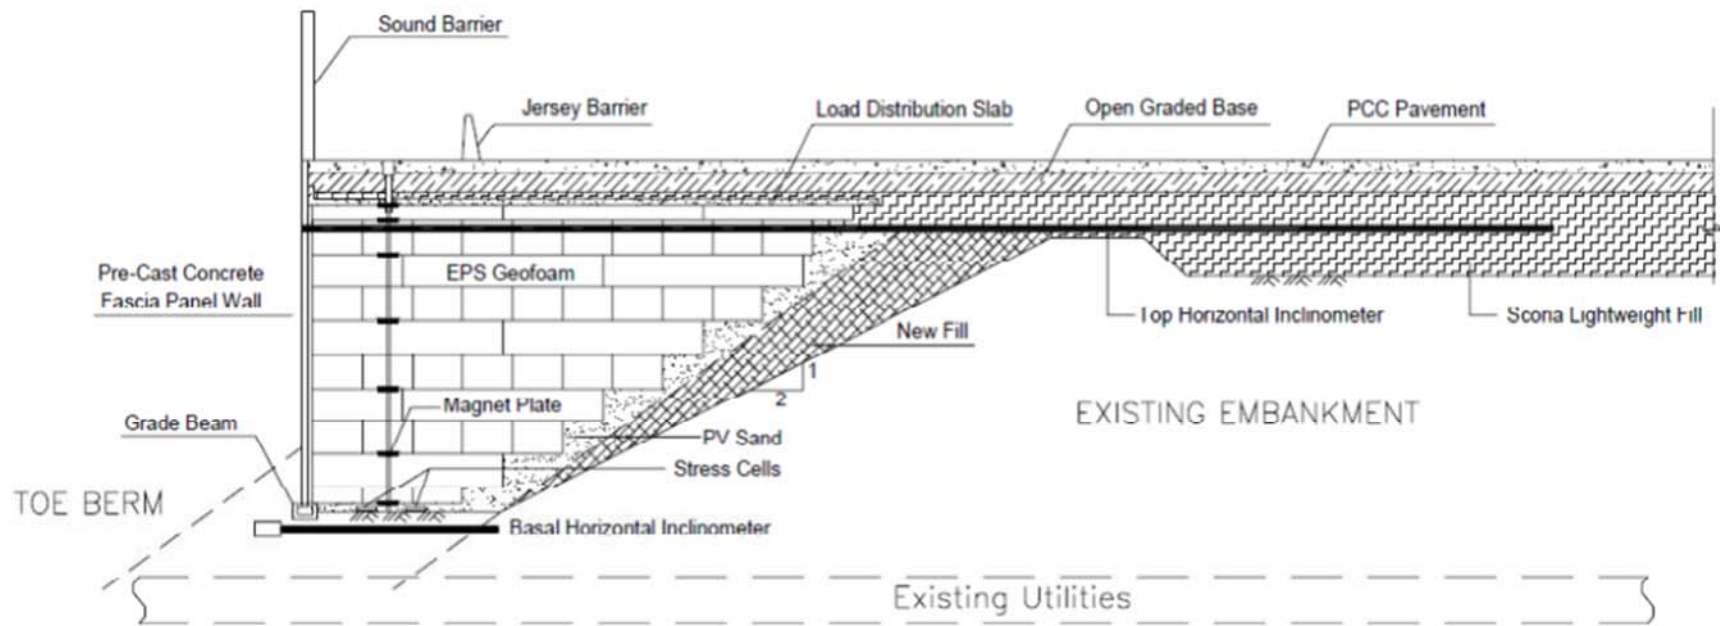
Cross-sectional View of the EPS Embankment and Instrumentation
